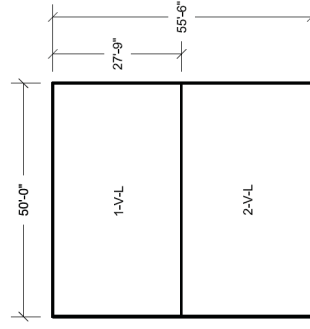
H.6-118: COOLING TOWER WEST WALL LOOKING EAST
